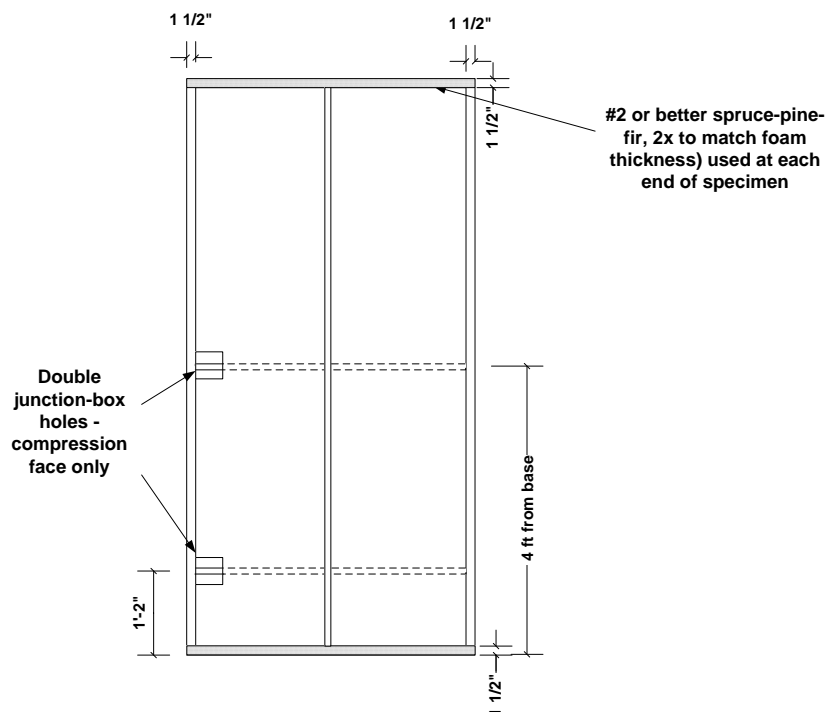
Specimen configuration for axial load tests (1 inch = 25.4 mm)
